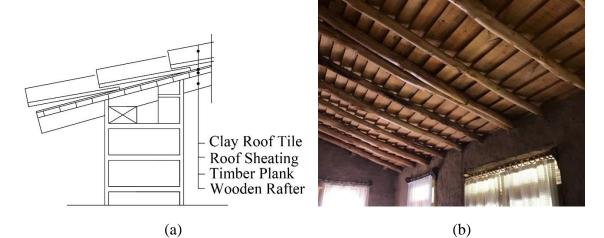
Section of the roof (a) and downside view of the roof (b) (Photography: Ekin G. Yöney, (2019), Location: Fethiye, Muğla)
